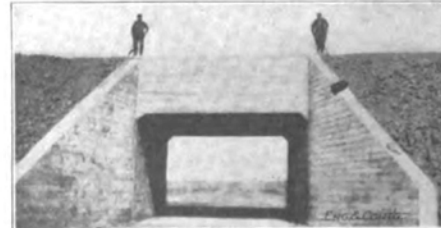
Standard Reinforced Concrete Highway Under-Crossing on C. M. & St. P. Ry., in South Dakota.
